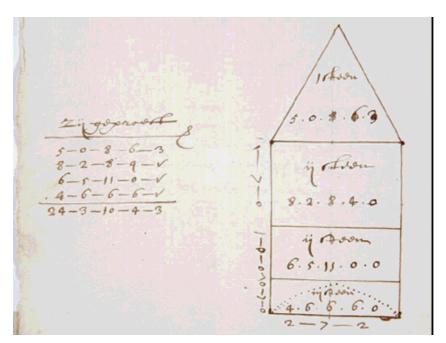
Section of the Faliedebagijnekerk drawn by Jan van Hout, showing the wall dividing the nave and the apse (Leiden University Library
